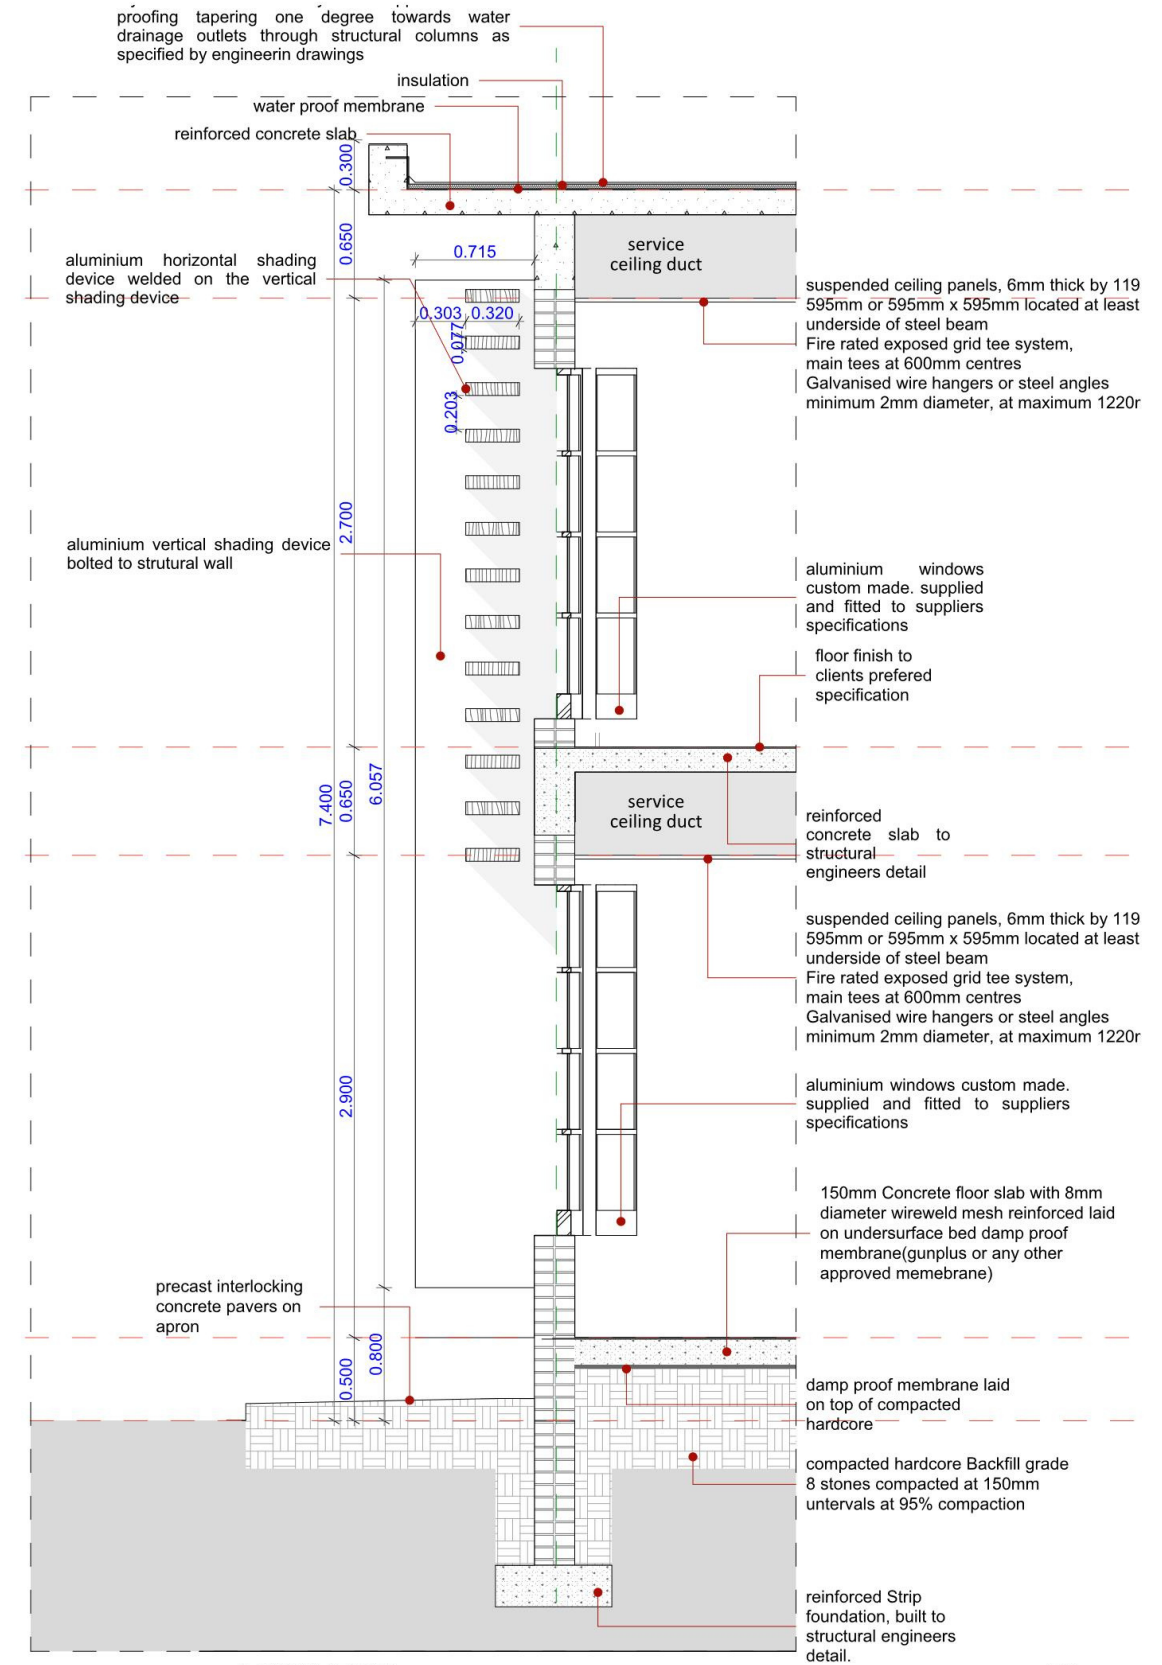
Detail 04 - Wall section, western facing facade with horizontal shading devices on the skin of the building
